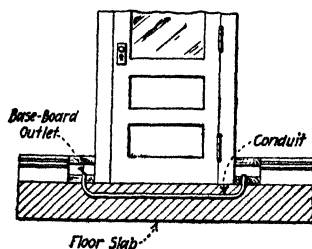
Baseboard molding connected around a door with concealed conduit.
